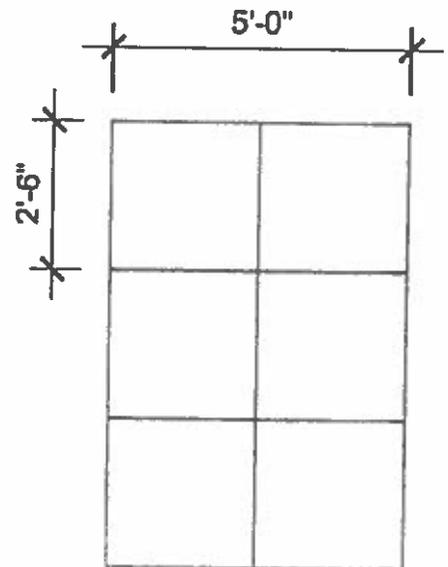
SECONDARY WALKWAY PAVING PATTERNS
